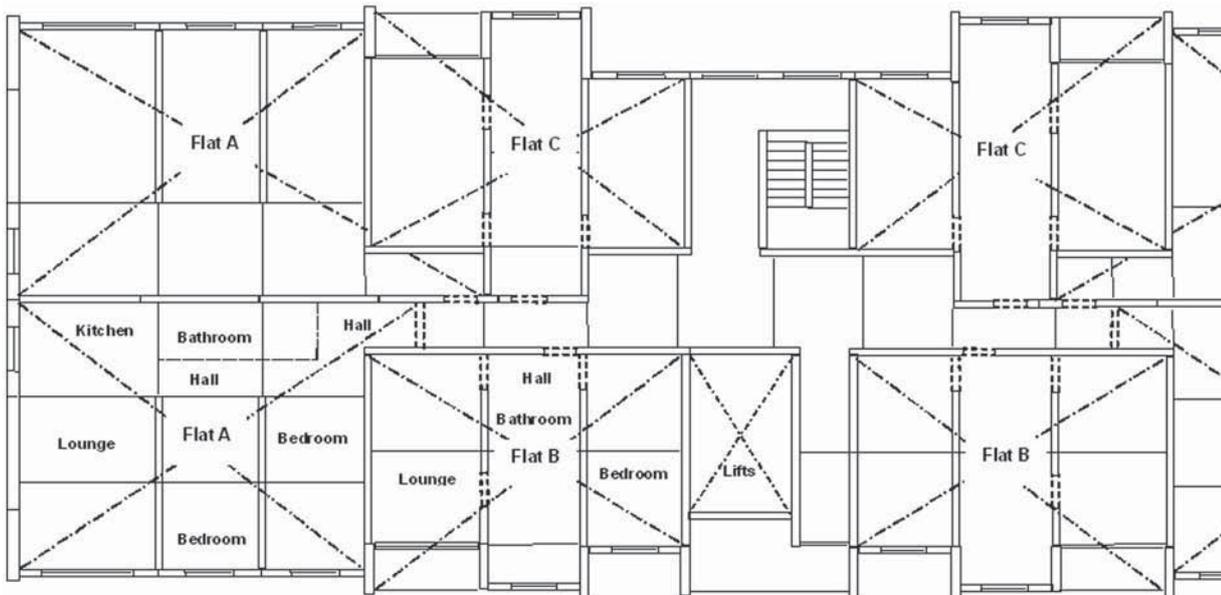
illustrates the general arrangement of the wall and floor panel construction forming a notionally typical LPS dwelling block. In reality there are significant differences in the details of the individual forms of LPS construction, which were proprietary products produced by the various manufacturers of the day. It is also common for there to be differences in aspects of the structural details employed by a particular manufacturer for buildings at different locations, reflecting specific requirements of the building owner or commissioning authority.
